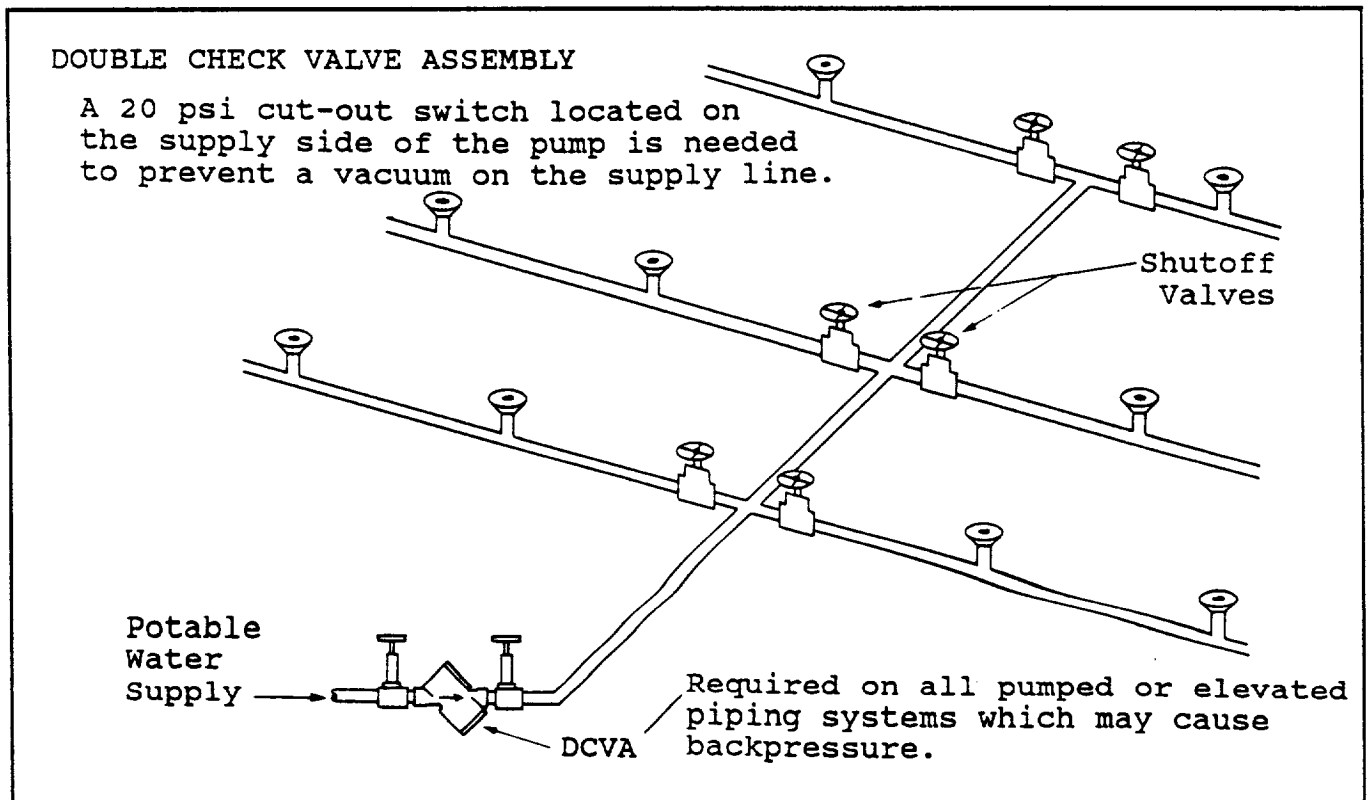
Hillside Irrigation System Using Double Check Valve Assembly.
